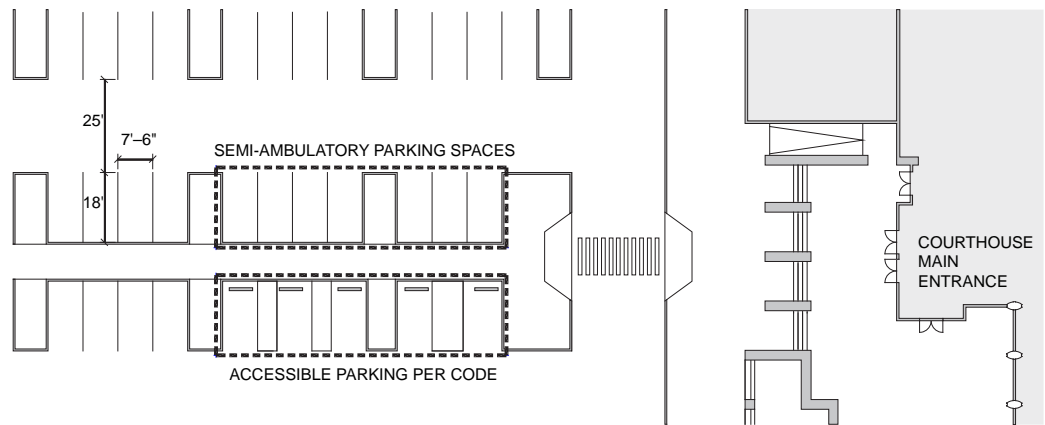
Parking Layout Showing Location of Accessible and Semiambulatory Spaces
